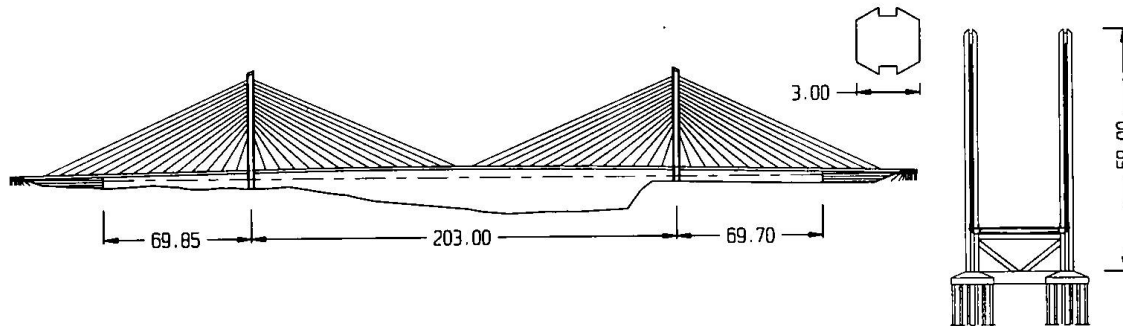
Papaloapan cable-stayed bridge (bridge and tower elevations; shaft cross section)
